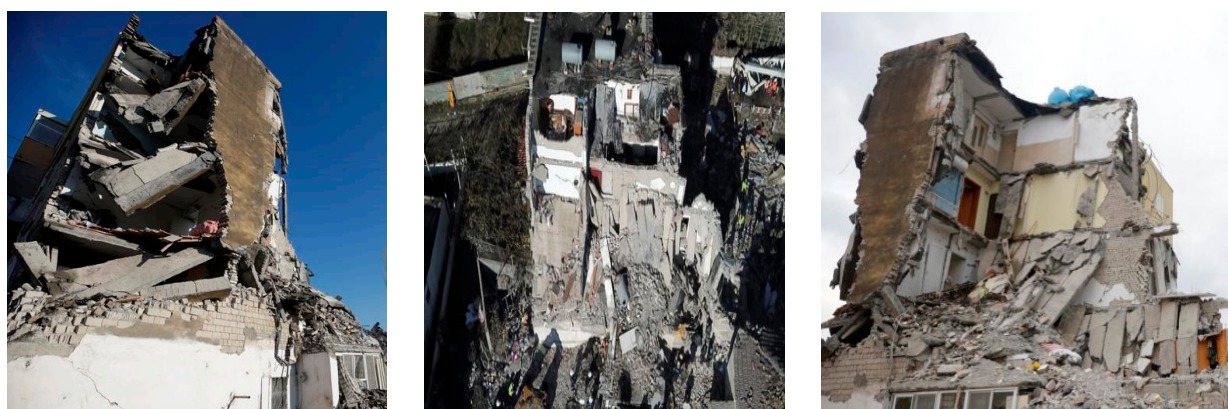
Collapsed building in Thumanë (1- added story before the collapse).
